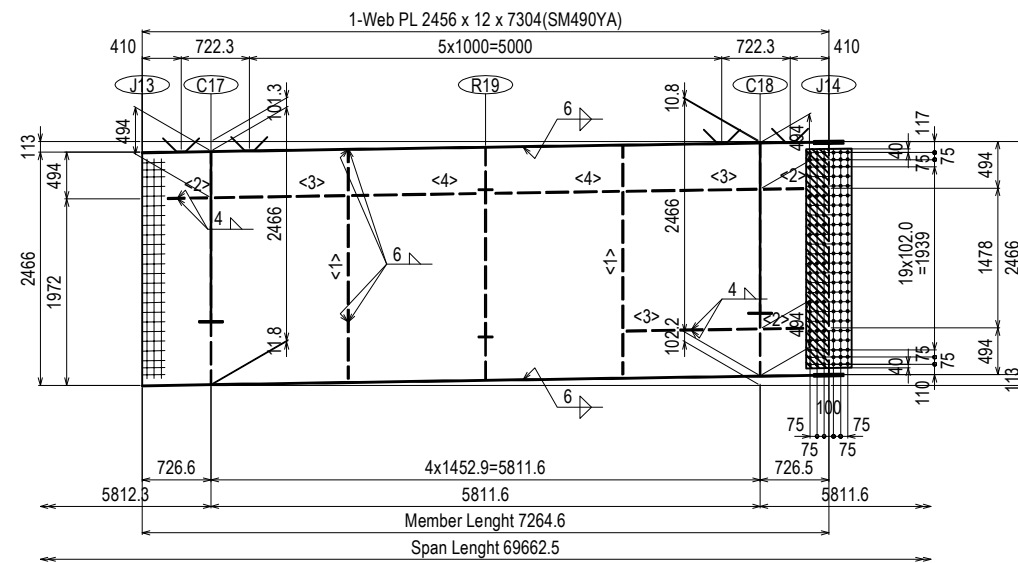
DETAIL OF MAIN GIRDER G1 (PF2-PF5) (14) S=1:80
